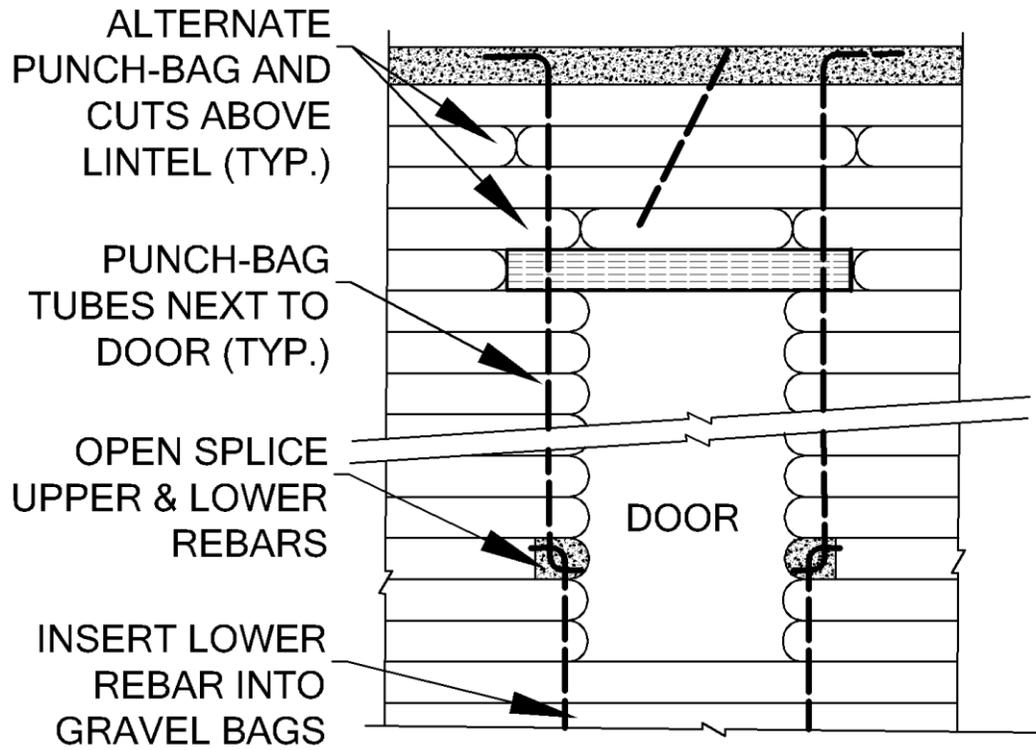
Splice vertical rebars next to doorways to provide vertical rebars extending below the door sill.
